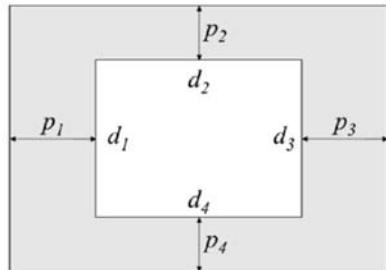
Measurement of the dimensions (d₁ to d₄) and positions (p₁ to p₄) of an opening on a structural element
